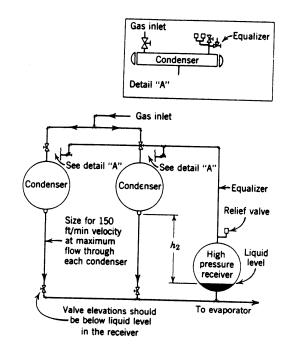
Parallel shell-and-tube condensers with bottom inlet receiver. (Courtesy of York Corporation.)
